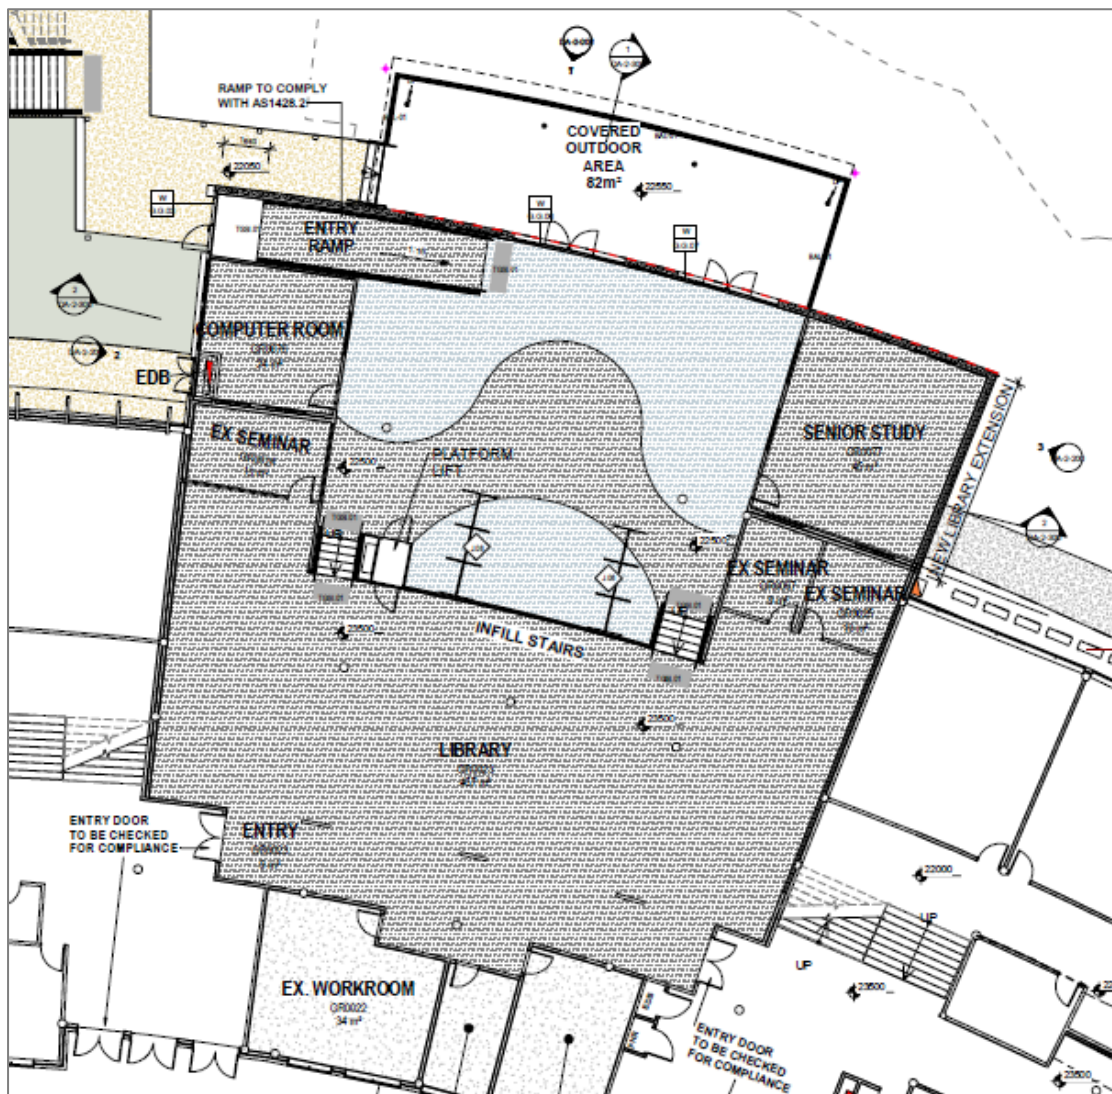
Proposed Library and Covered Outdoor Area Floor Plan
